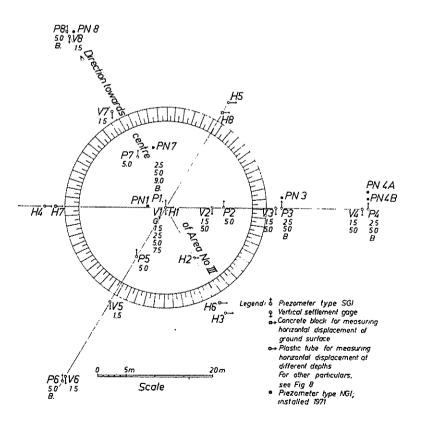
AREA IV: GAGE LOCATIONS AND DEPTHS BELOW GROUND SURFACE IN m. FROM HANSBO (1960).
